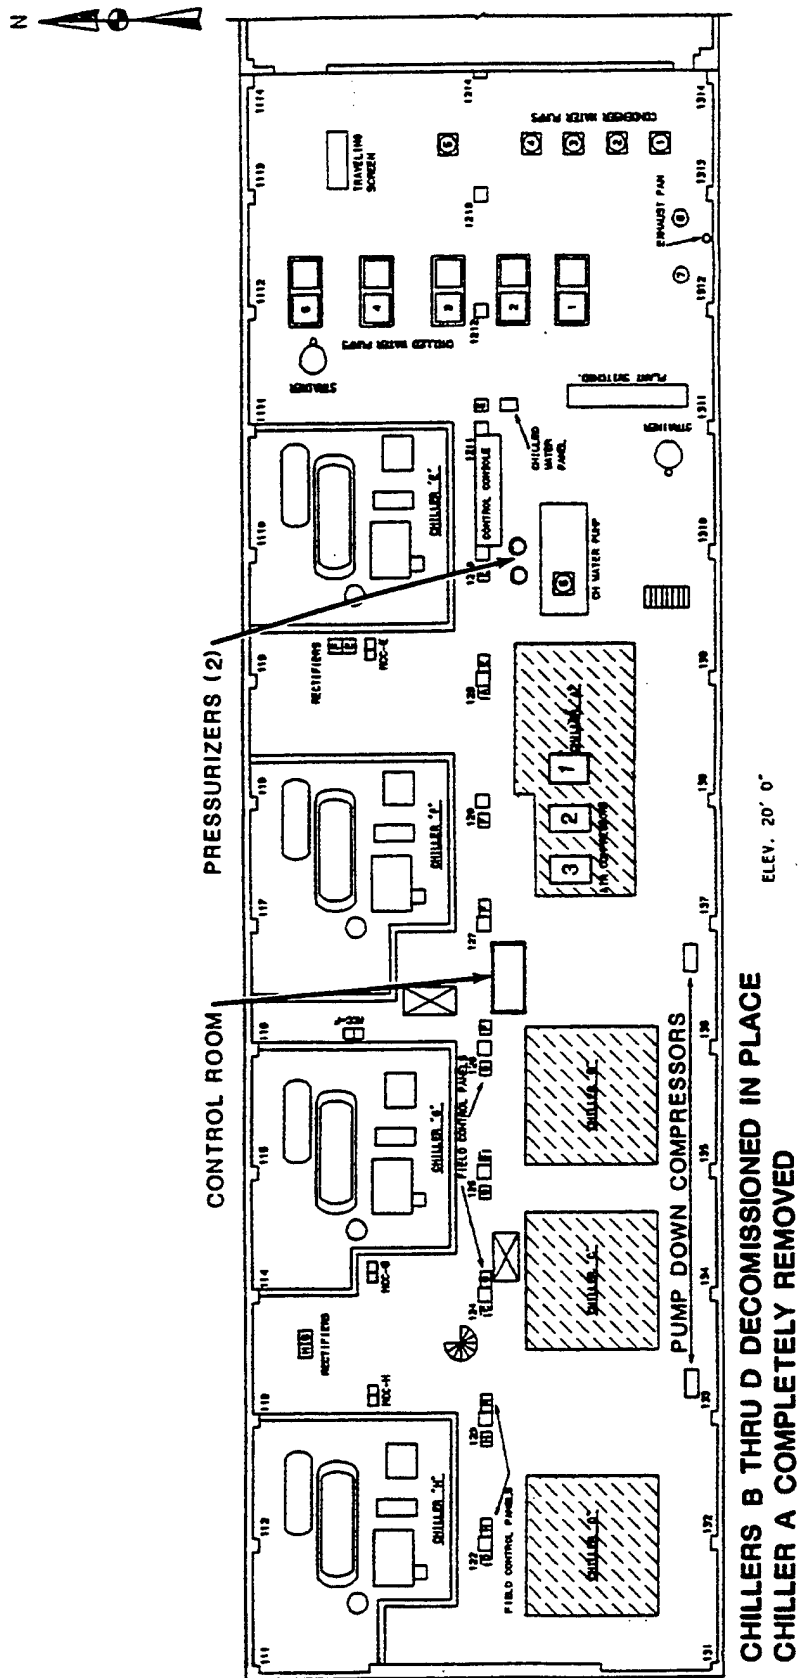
Operating Floor Refrigeration Plant - Adapted From
